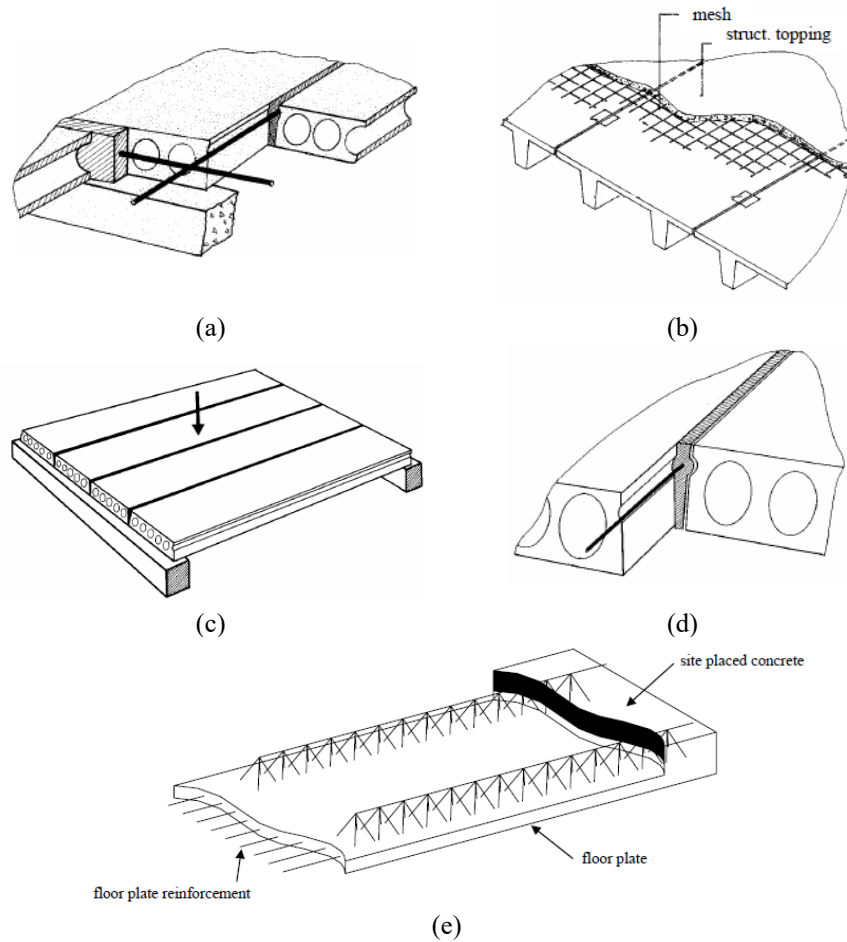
“Representation of the: (a) typical hollow core floor system; (b) typical double-T floor system; (c) transverse load distribution; (d) joint detail with longitudinal shear key; (e) composite floor plate floor system with lattice girders” (FIB 43, 2008).
